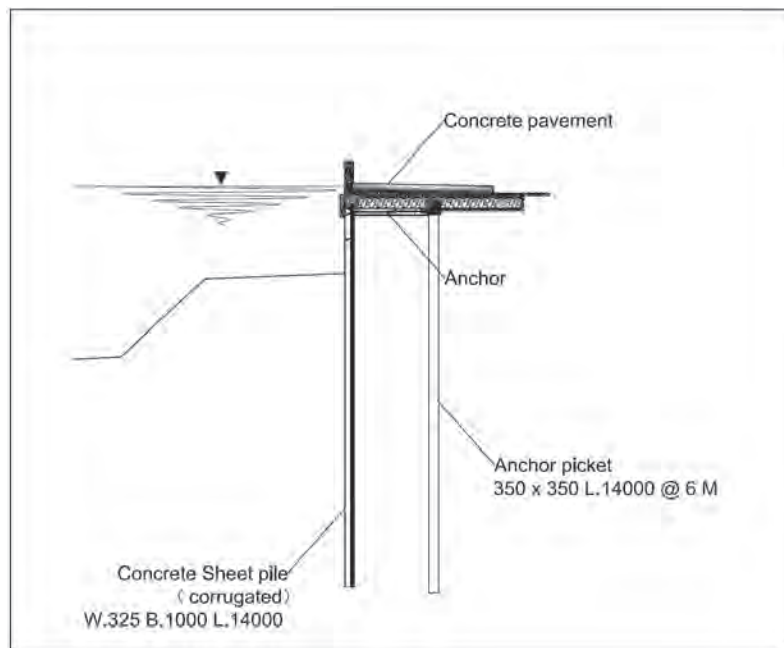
Cross Sections of Excavation for Wastewater Treatment Facilities and Shore Protection of Banjir Canal
